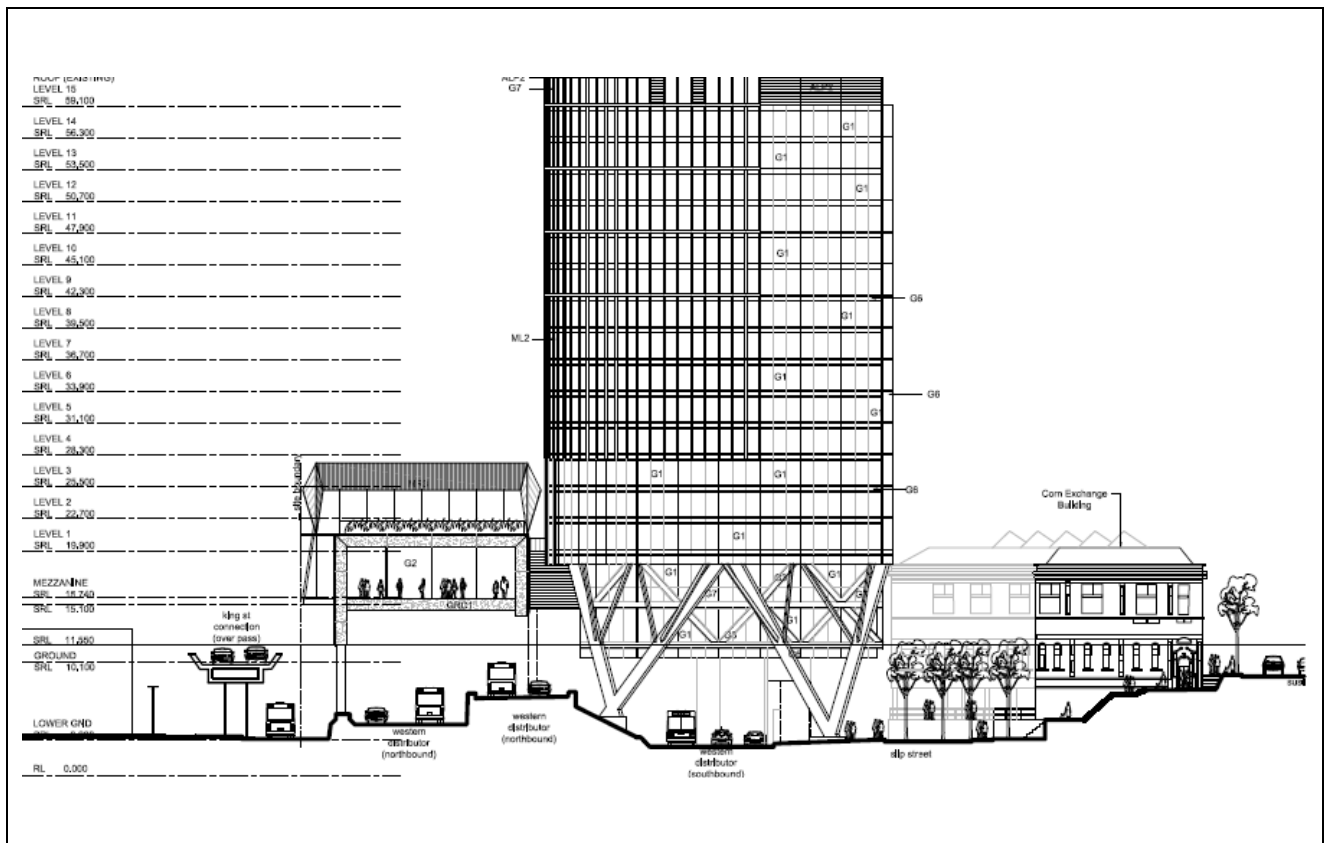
Approved structural columns, trusses and footings design under the tower (South Elevation)
